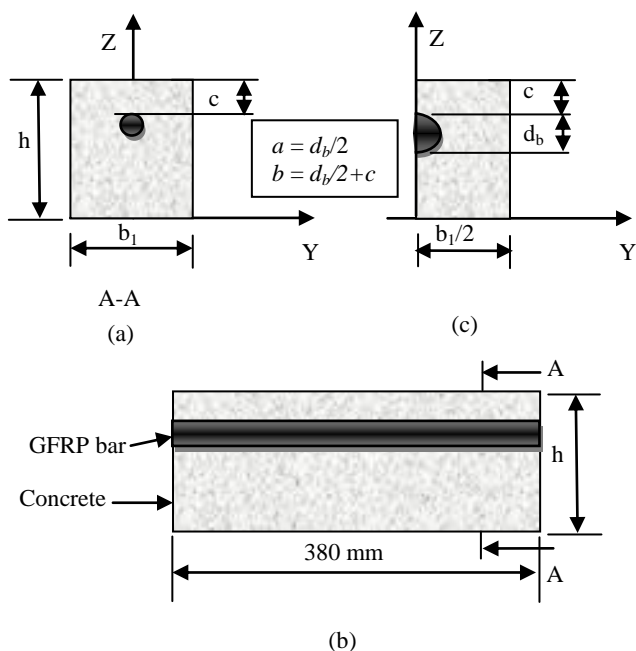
Prismatic concrete beam reinforced with GFRP bar modeled
